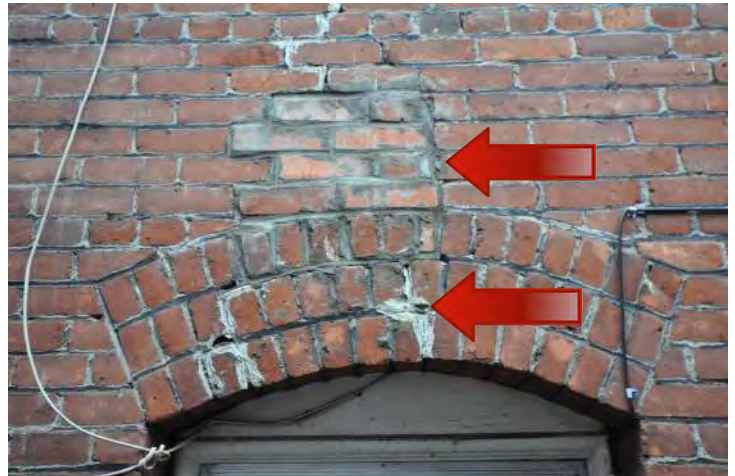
Detail at cracks and failed sealant repairs, south elevation. Note also that the arch has settle and is not round like other in tact openings.
